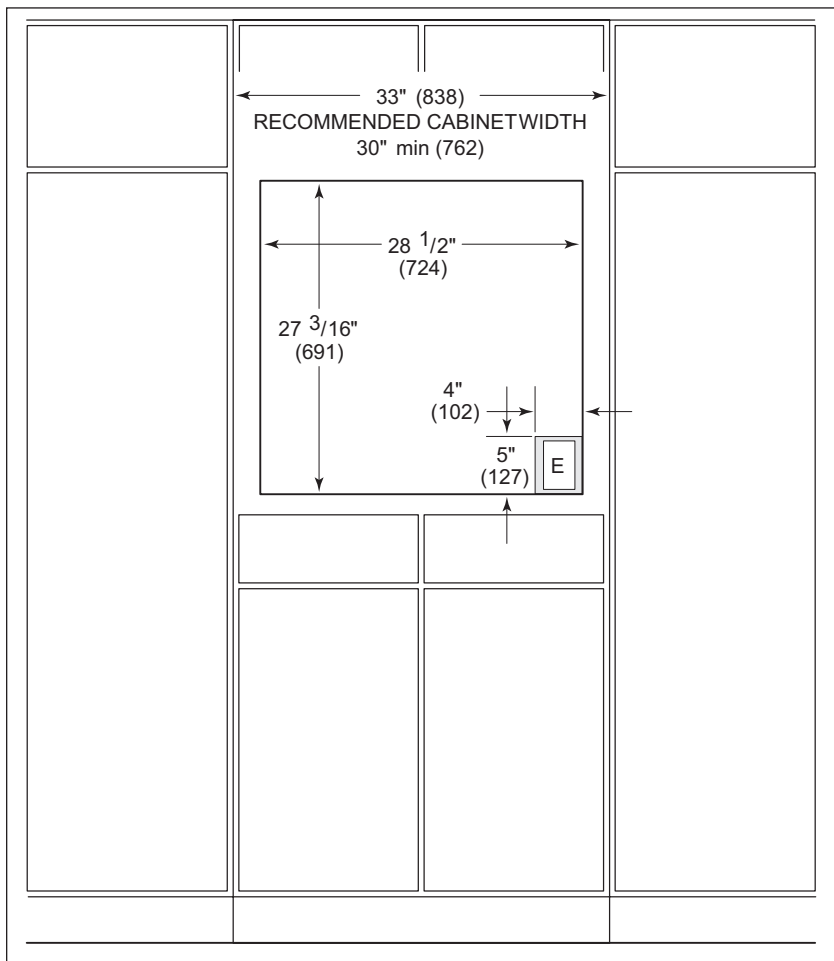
Front Cutout Dimensions and Electrical Placement
